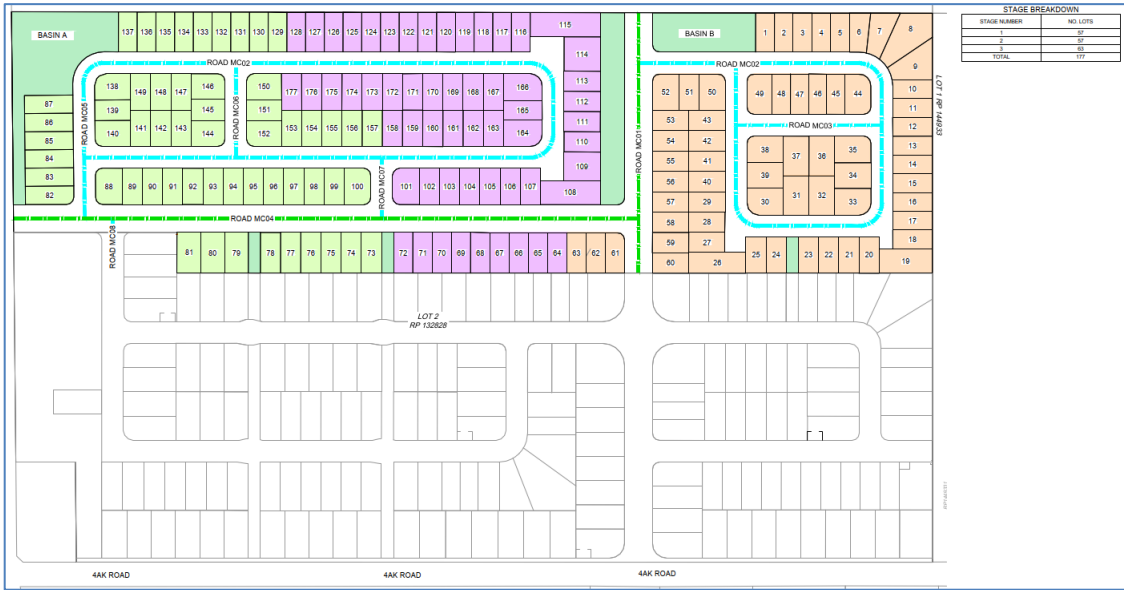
Subdivision Layout Plan (Source: Arcos Group 2026)
